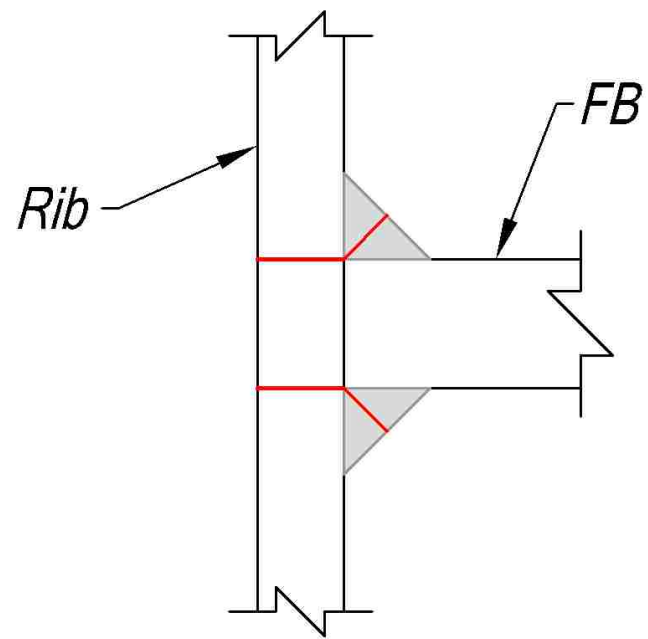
Potential modes of root cracking shown on typical rib-to-floor beam connections
